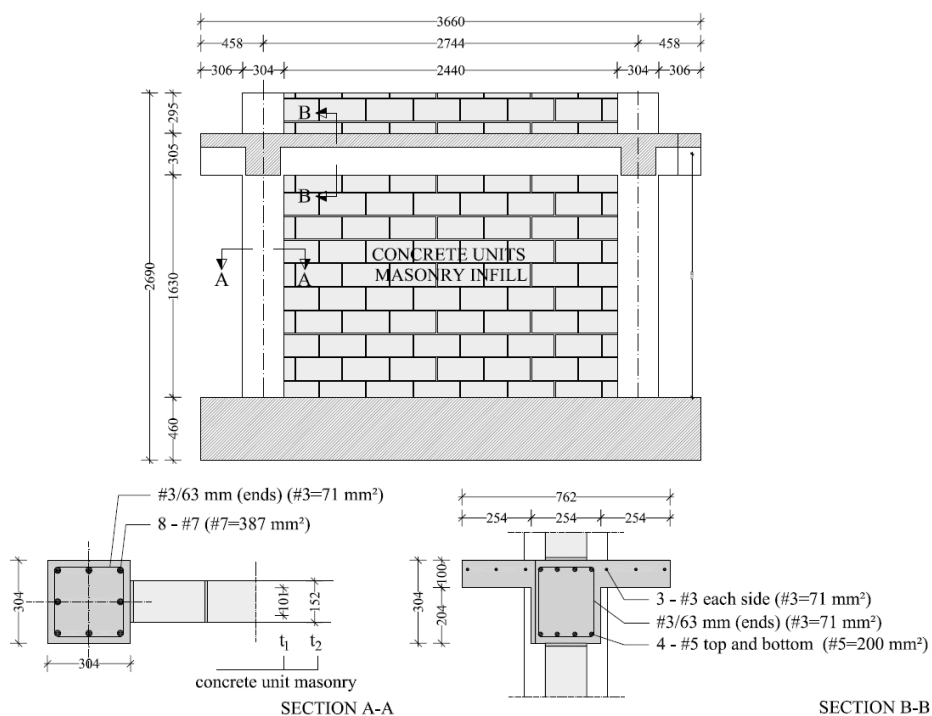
Detail of the concrete unit masonry infilled frame specimens (Angel *et al.* (1994)).
